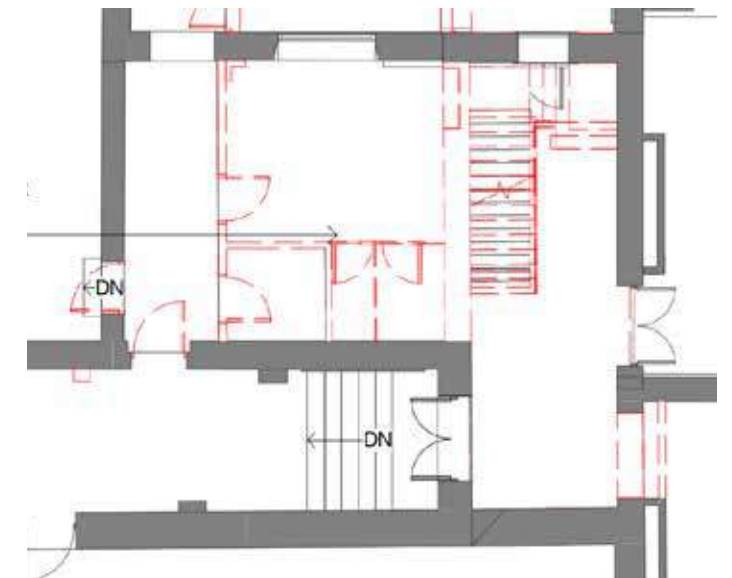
Existing plan of the staircase at ground floor level. Red = fabric proposed to be removed
